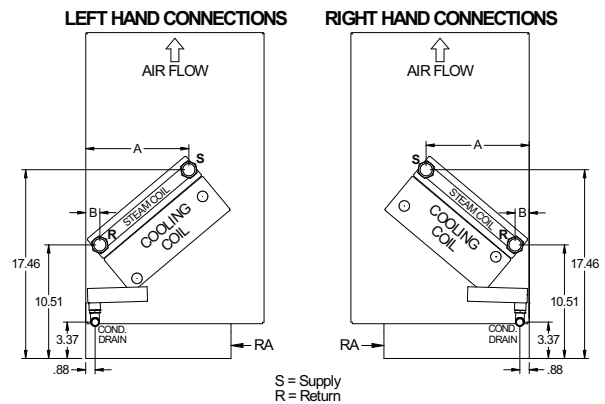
Steam Re-Heat Coil With Chilled Water/DX Cooling Coil (No Piping Package)
